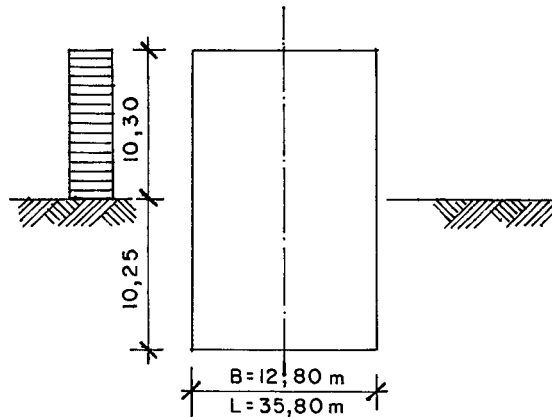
PUMP HOUSE - TYPICAL SECTION
